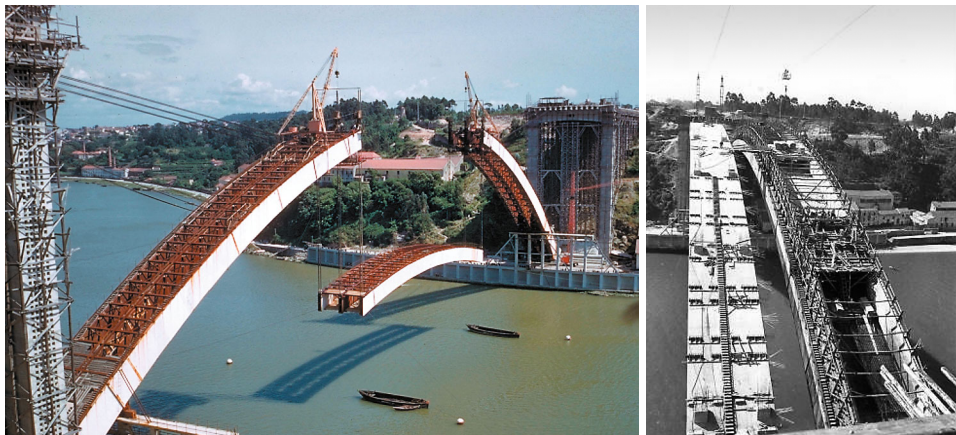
Arrábida Bridge – Portugal (270 m span, designed by Edgar Cardoso).
